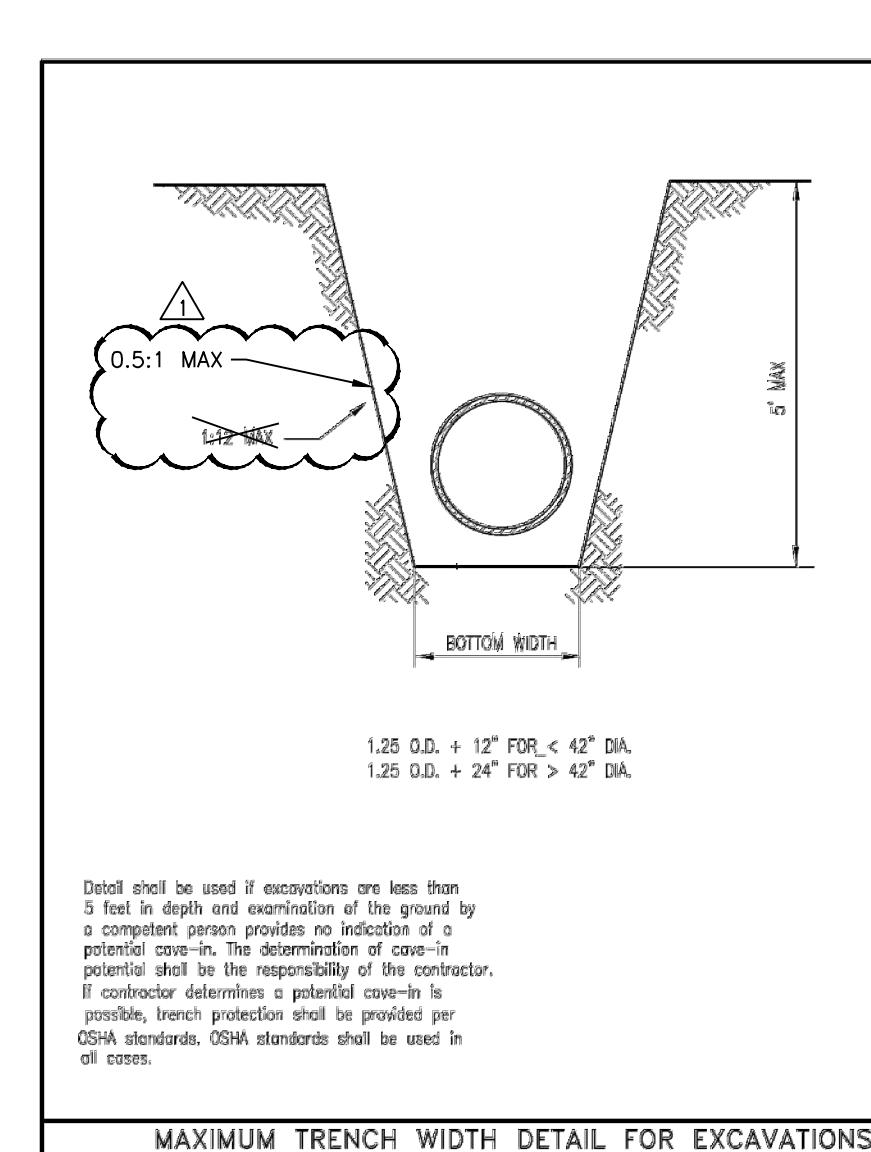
Maximum Trench Width Detail for Excavations - within five feet of edge of pavement
